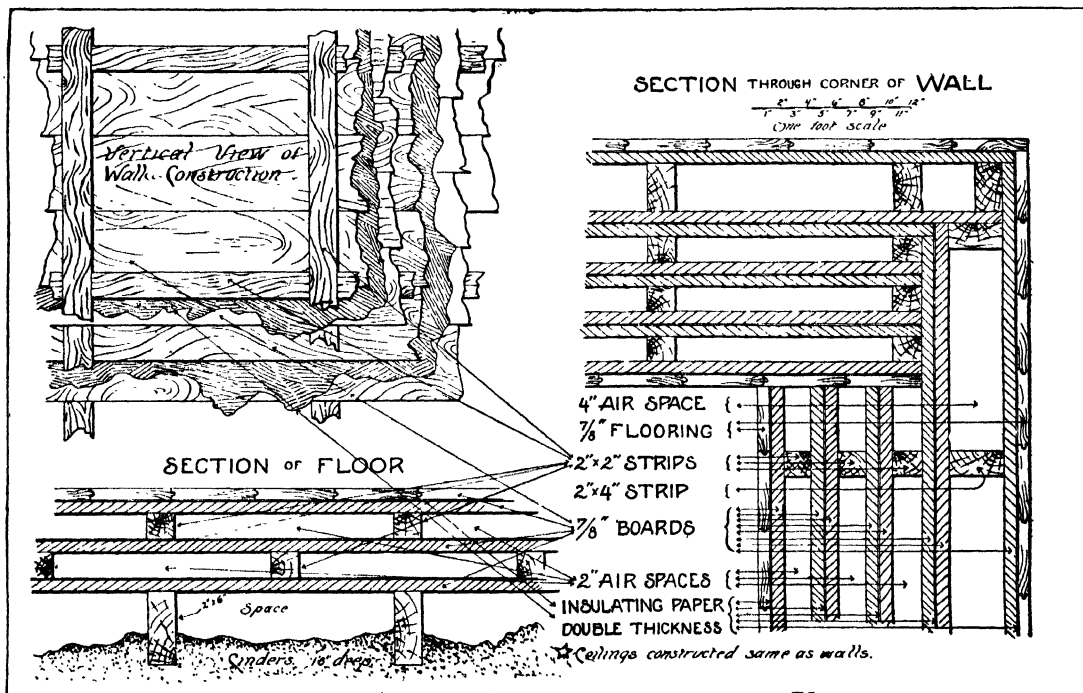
Details of floor and wall construction of the average creamery refrigerator.
